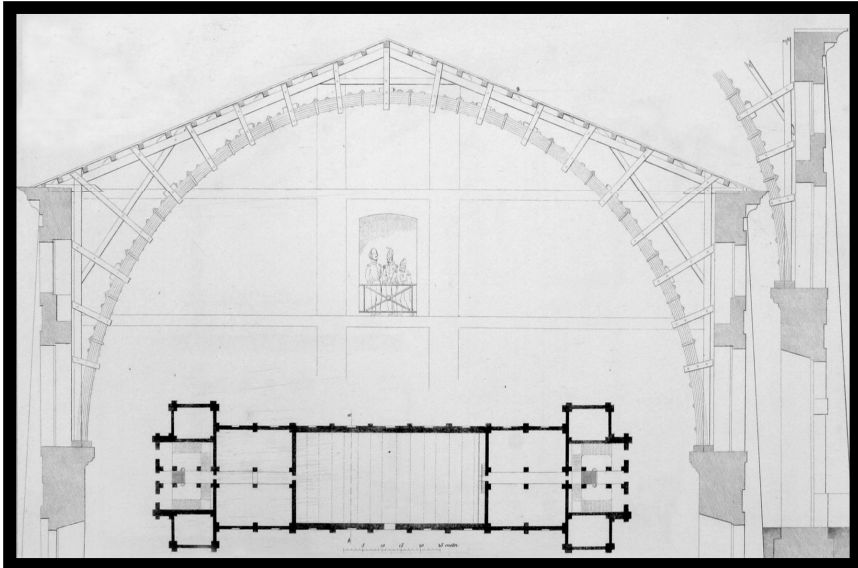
Plan, cross and longitudinal sections of Liborne's barrack (Emy, 1856, reference plate: 109)
